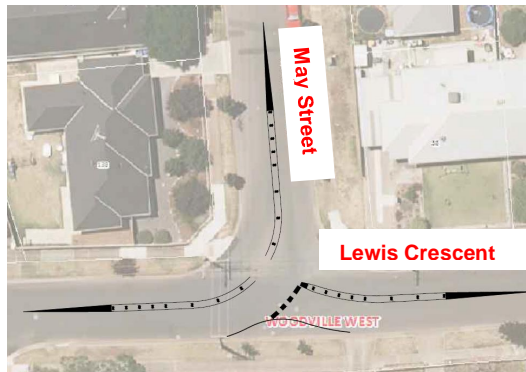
Proposed modified T-intersection at Lewis Crescent and May Street
